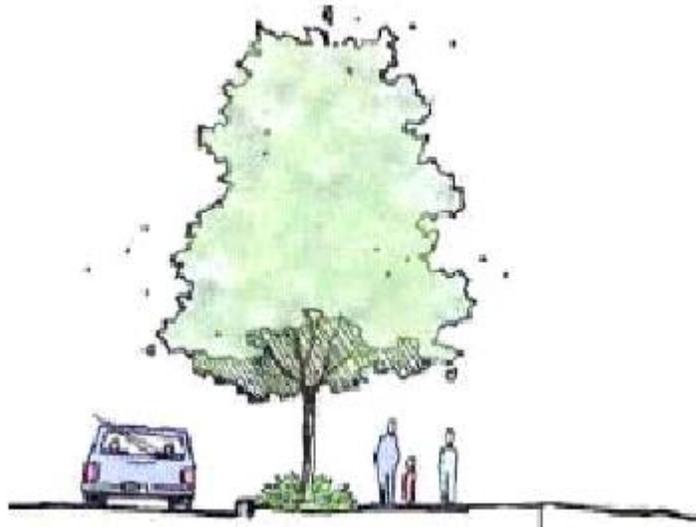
Example of on-street parking with street trees and 5 ft. wide sidewalks
